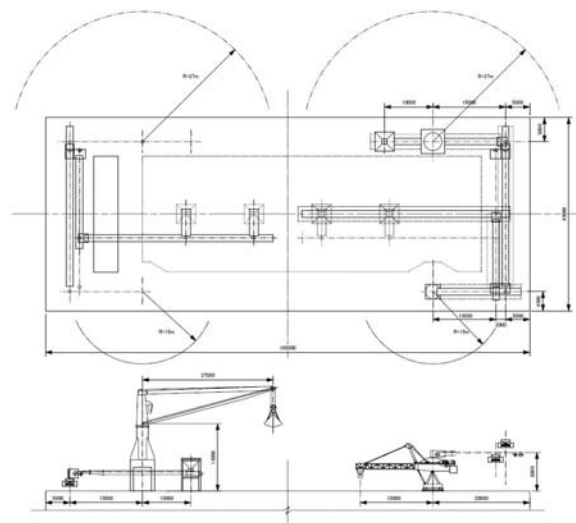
General Plan of Floating Type Facility (Grab Unloaders)
